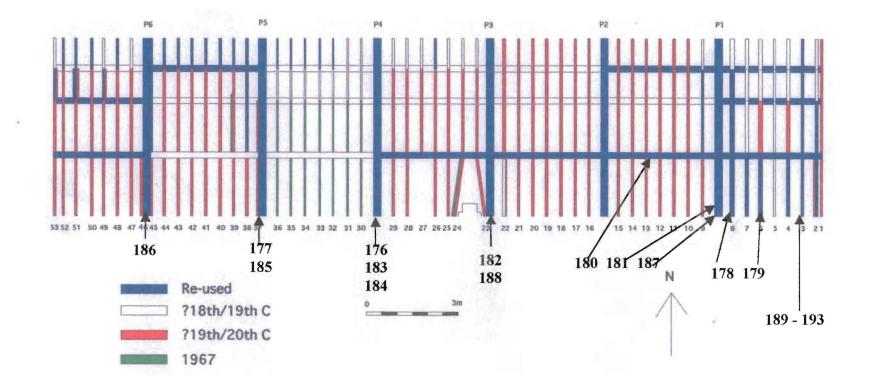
Long-section of the Choir south aisle roof to show probable phasing of timbers and location of timbers sampled (viewed from the south looking north)
